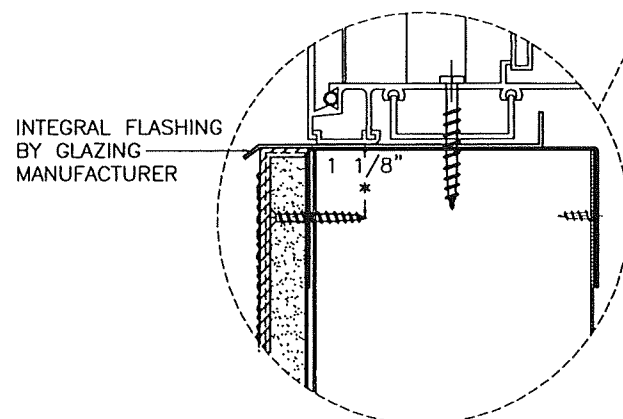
DETAIL B: WINDOW SILL CONNECTION TO PANEL
